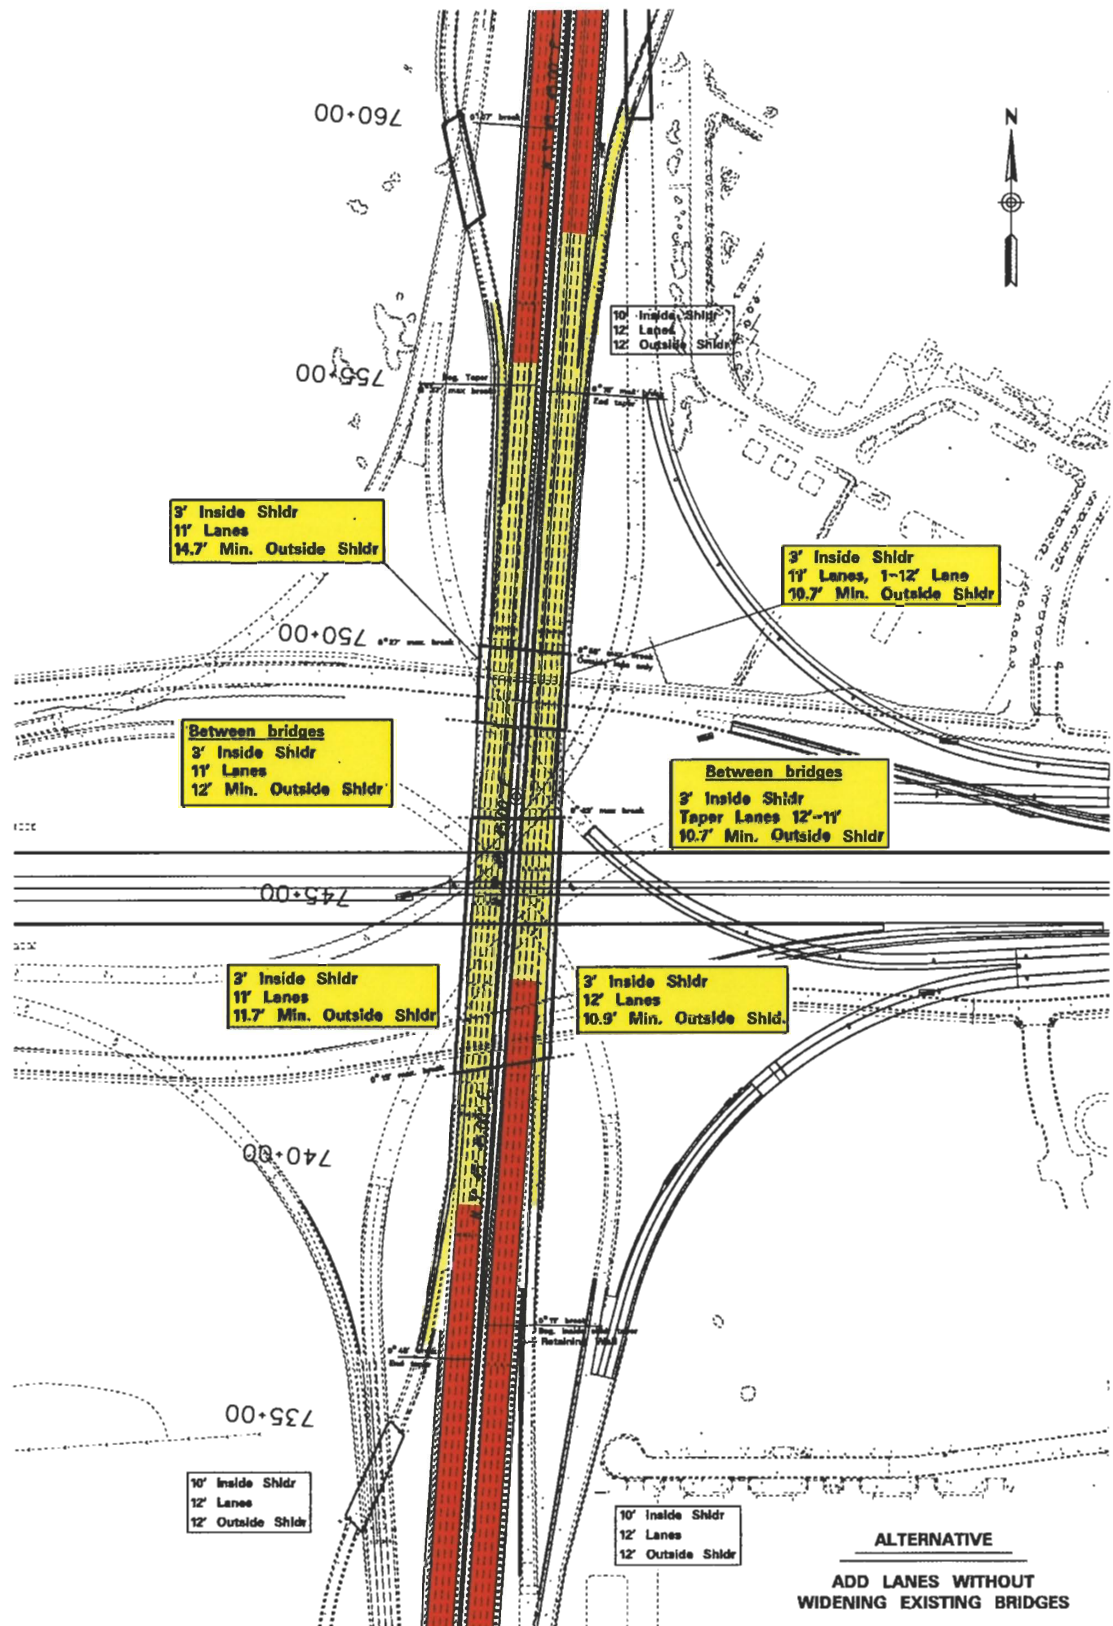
LANE WIDTHS: ADD LANES WITHOUT WIDENING EXISTING BRIDGES
